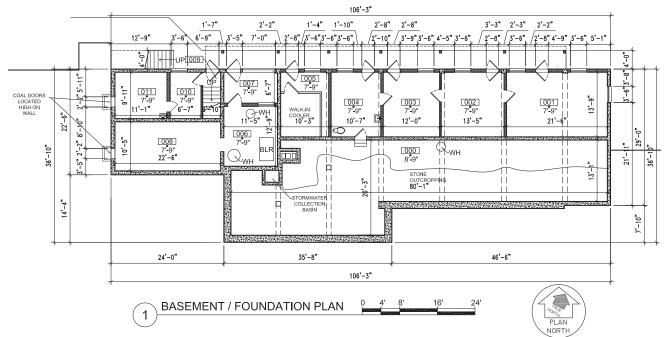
Basement level plan. A larger version of this plan can be found in Appendix B.
